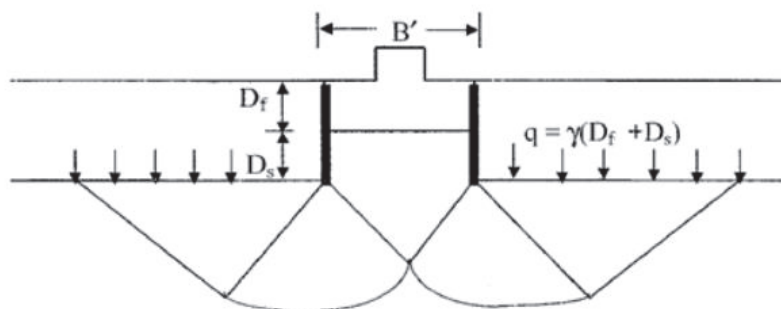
The failure mechanism of soil beneath a continuous foundation with a structural skirt under vertical loading.
